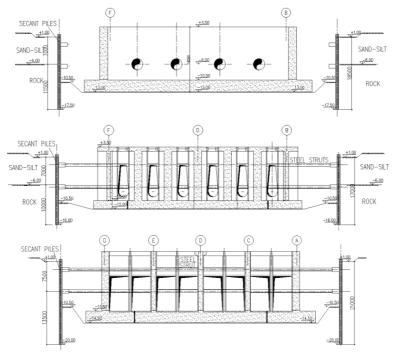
Sections B-B, C-C and D-D of Intake Structure.
